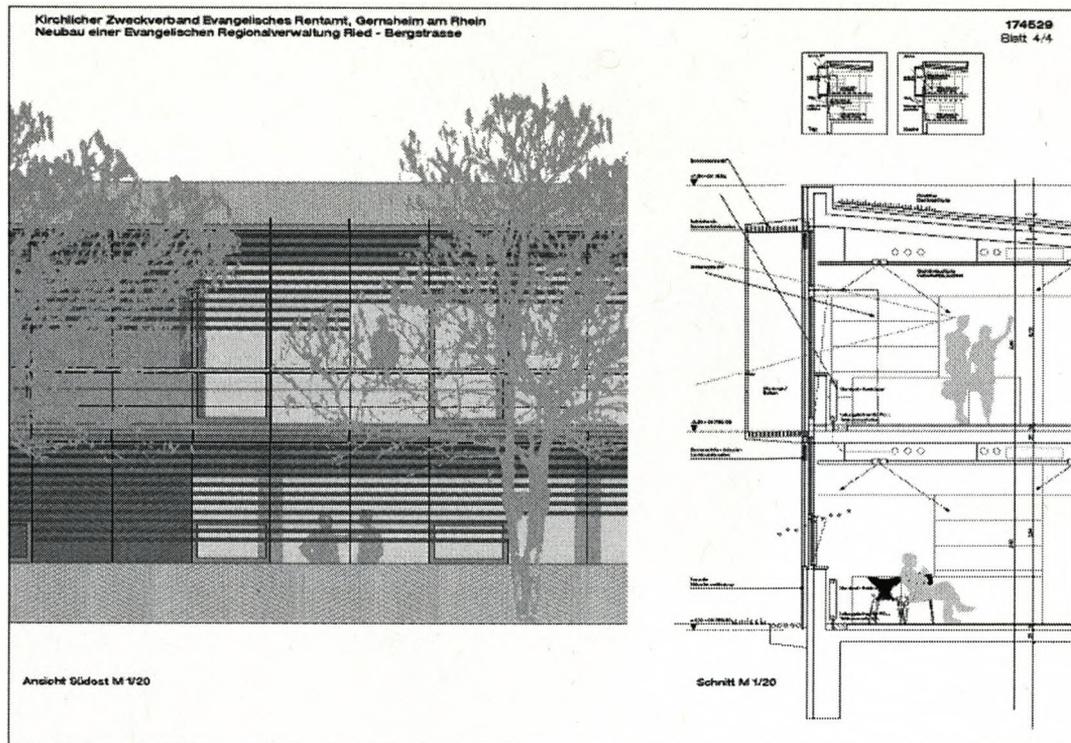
Gernsheim. Competition Entry sheet 4. Detailed section and elevation studies (not to scale).
